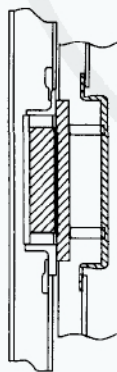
Swinging door. Lock mortised in jamb. Armature mortised in door edge. (E08591)
